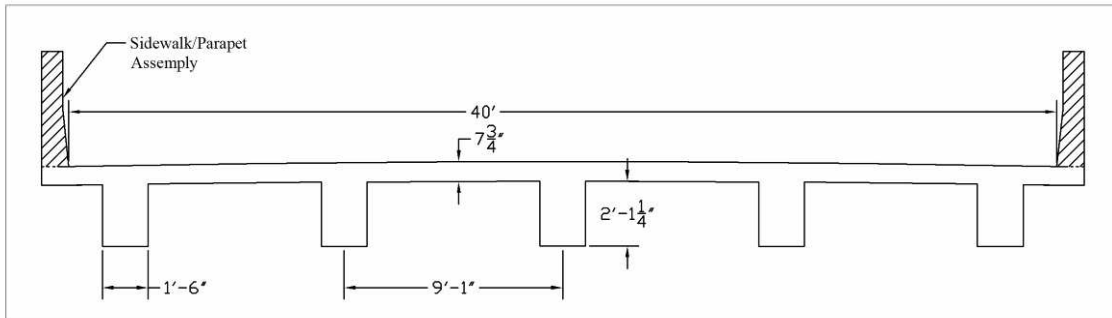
Cross Section of Bridge Deck and Supporting Girders (Ref. GDOT Drawings)
